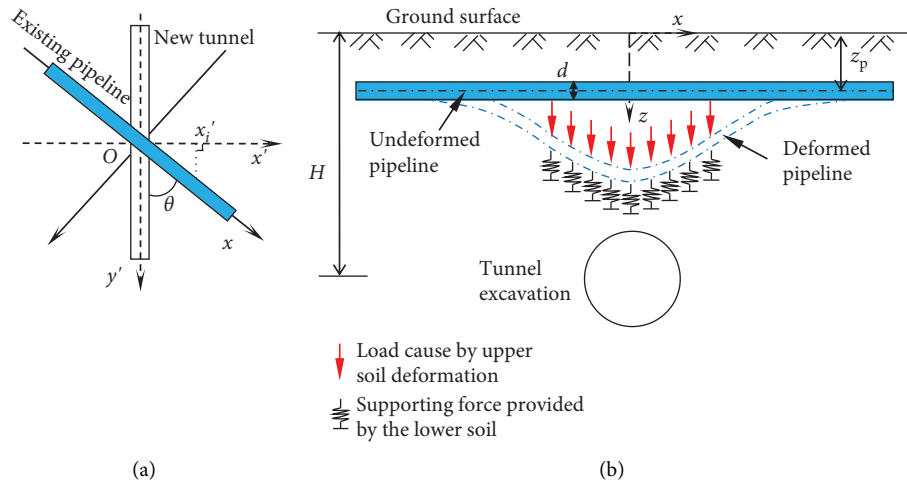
Deformation calculation diagram of pipeline during tunnel excavation. (a) Plan view. (b) Cross section view.
